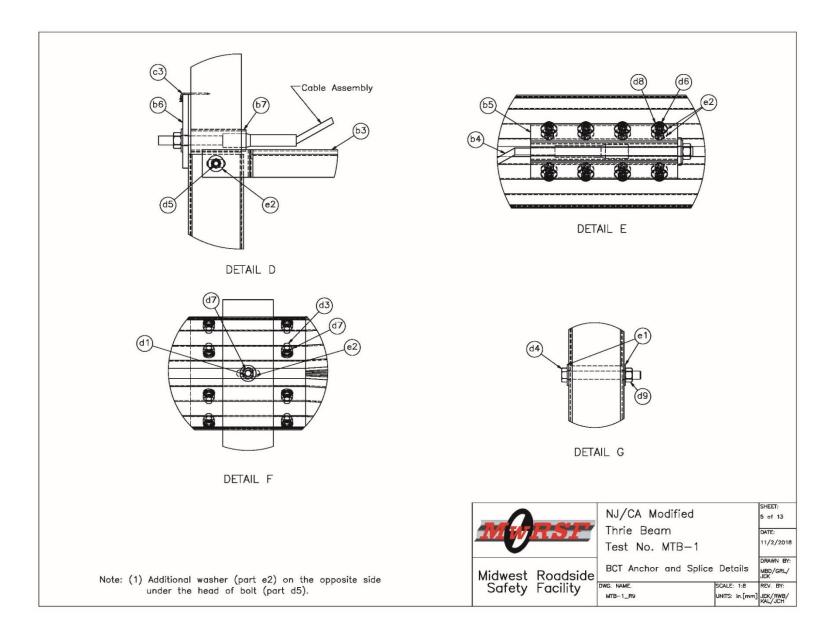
BCT Anchor and Splice Details, Test No. MTB-1
